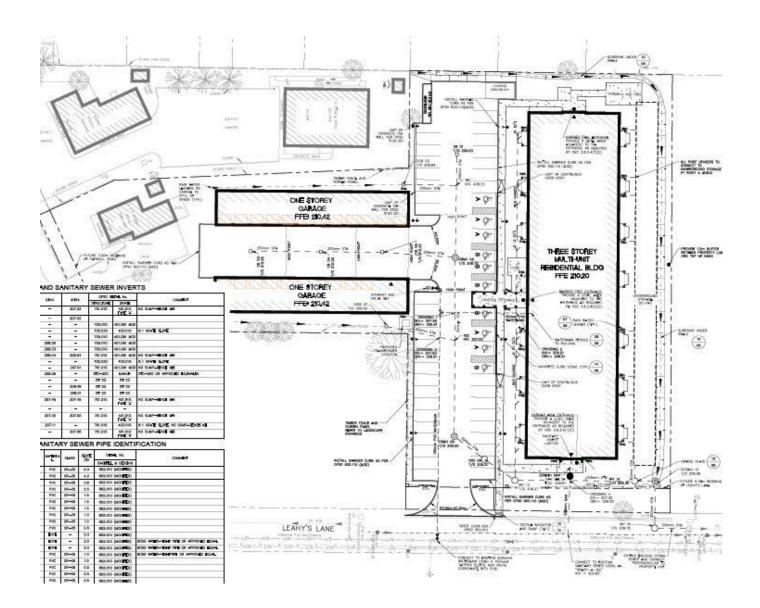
Exhibit B - Site Plan, Building Elevations Page 4 of 5
